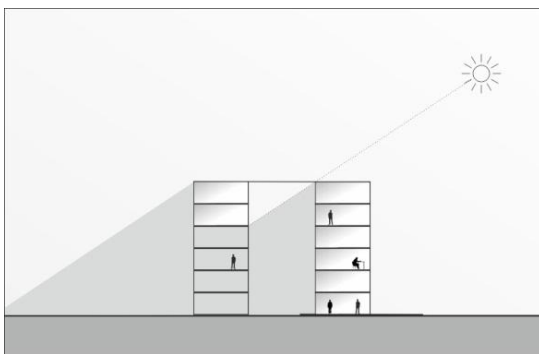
The building B is 6-story (3 additional floors were built after in 2012)
